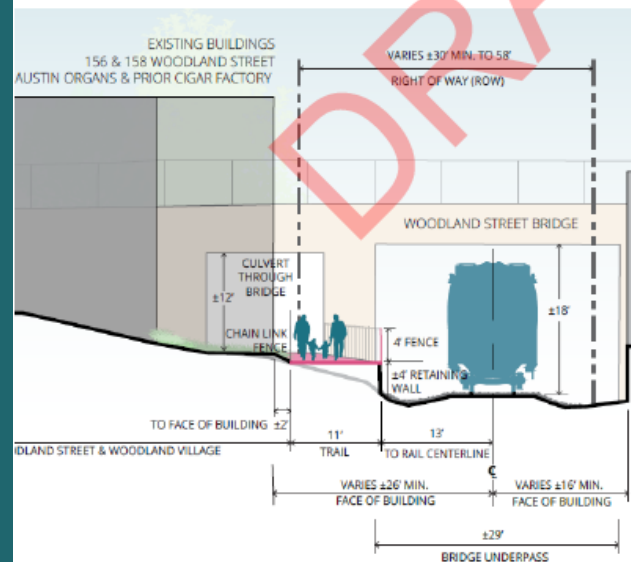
Cross Section excerpt of the Southwest Alternative, Location 4 (at Woodland Street). See the Appendix for all cross sections.
